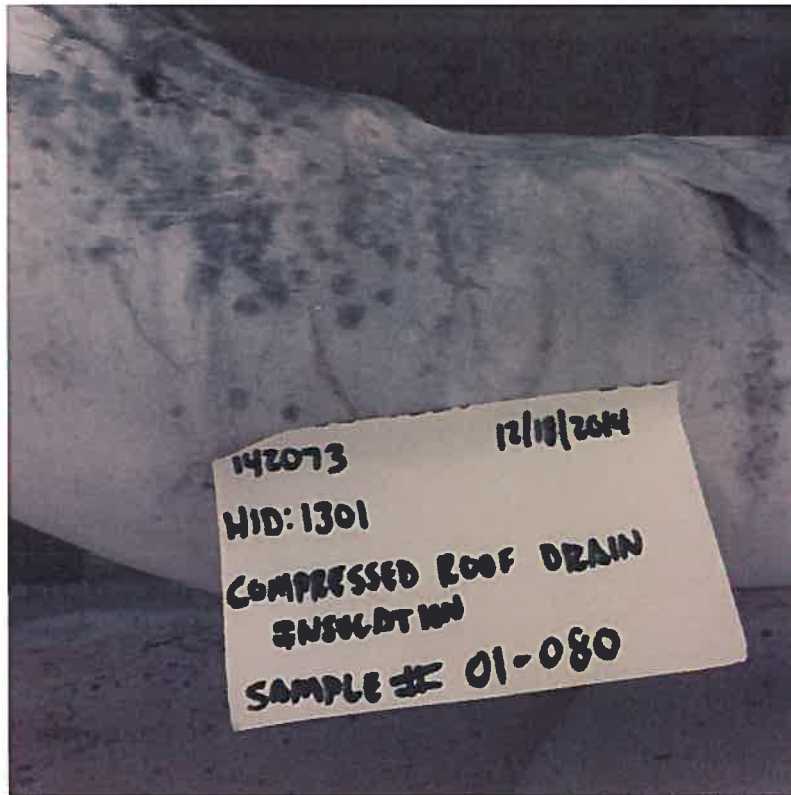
HID#1301 – Compressed Roof Drain Insulation
